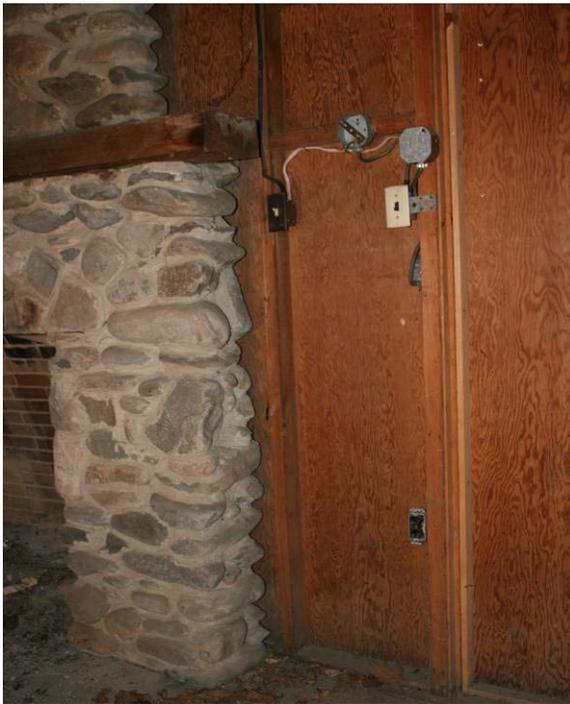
Toggle light switches, junction boxes, and exposed wiring at north wall of Room 101.
